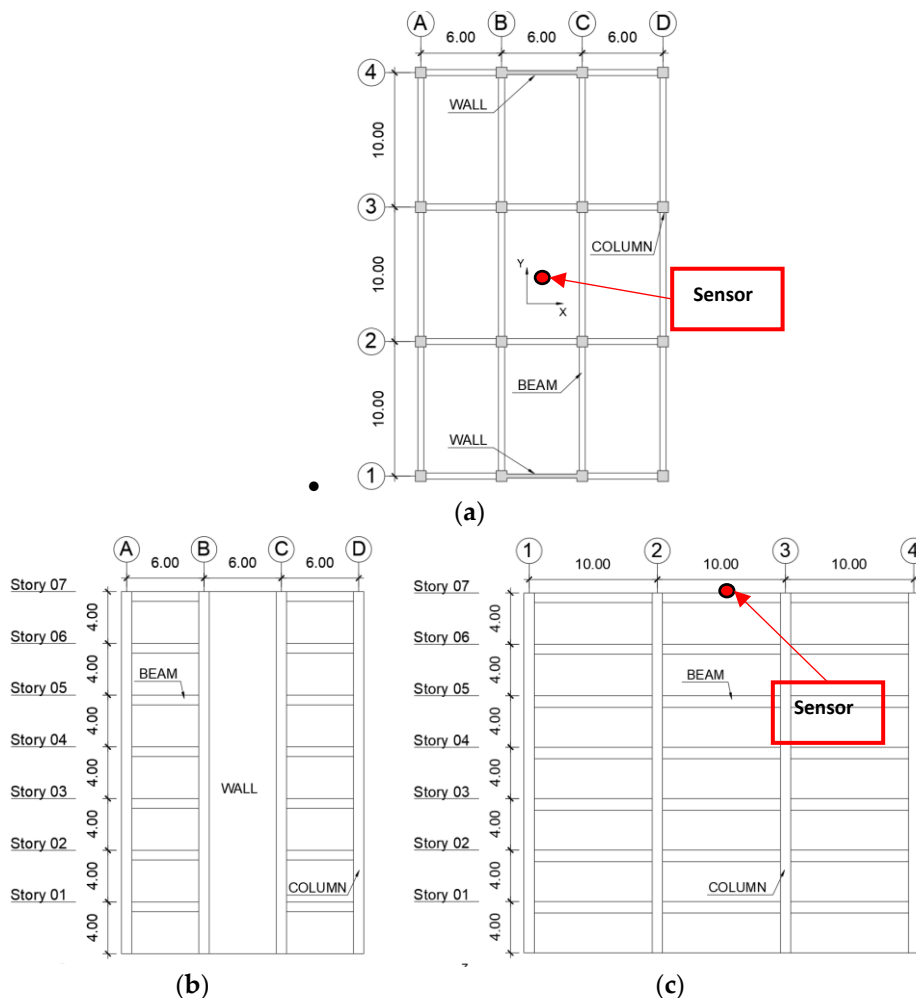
General drawings view of RC building. (a) Typical plan view; (a) Elevation of X-direction; (b) Elevation of Y-direction.
